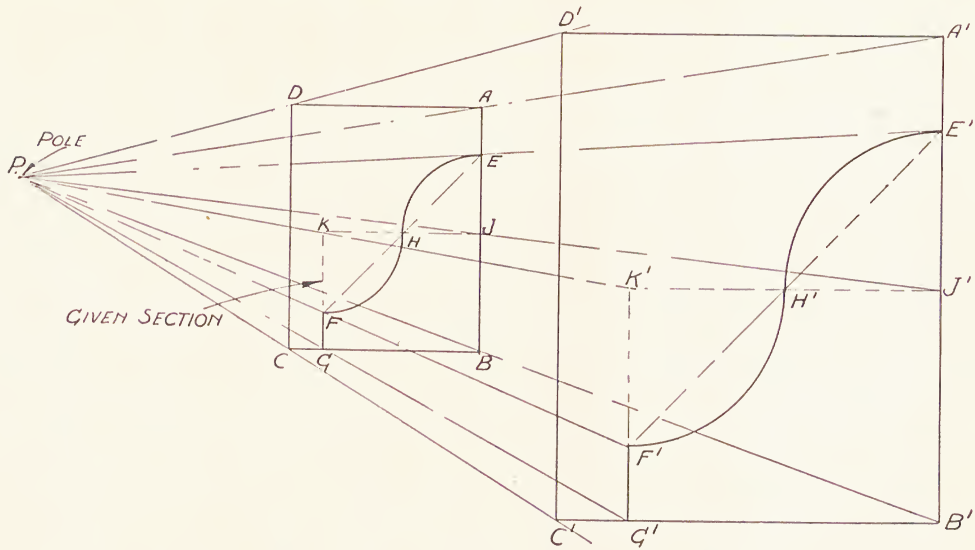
ENLARGING MOULDINGS BY RADIAL PROJECTION.
